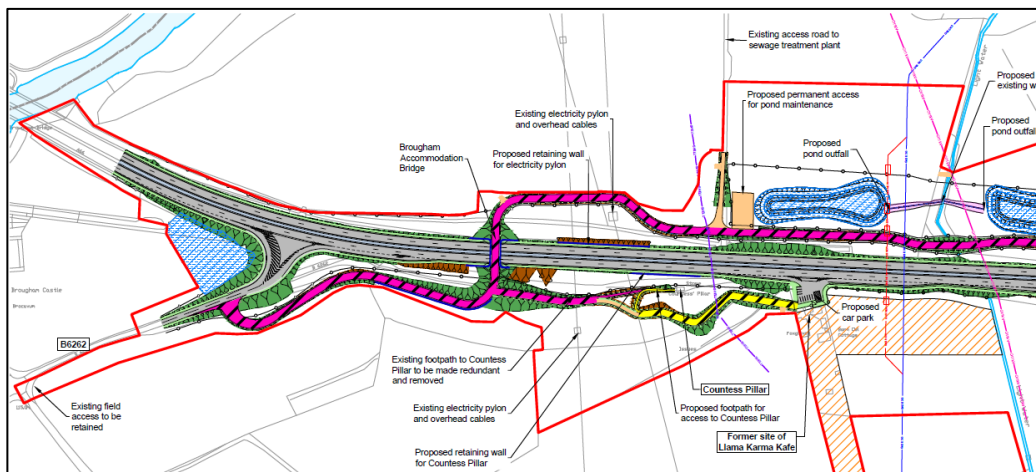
(c) Extract from General Arrangement Drawing (After)
